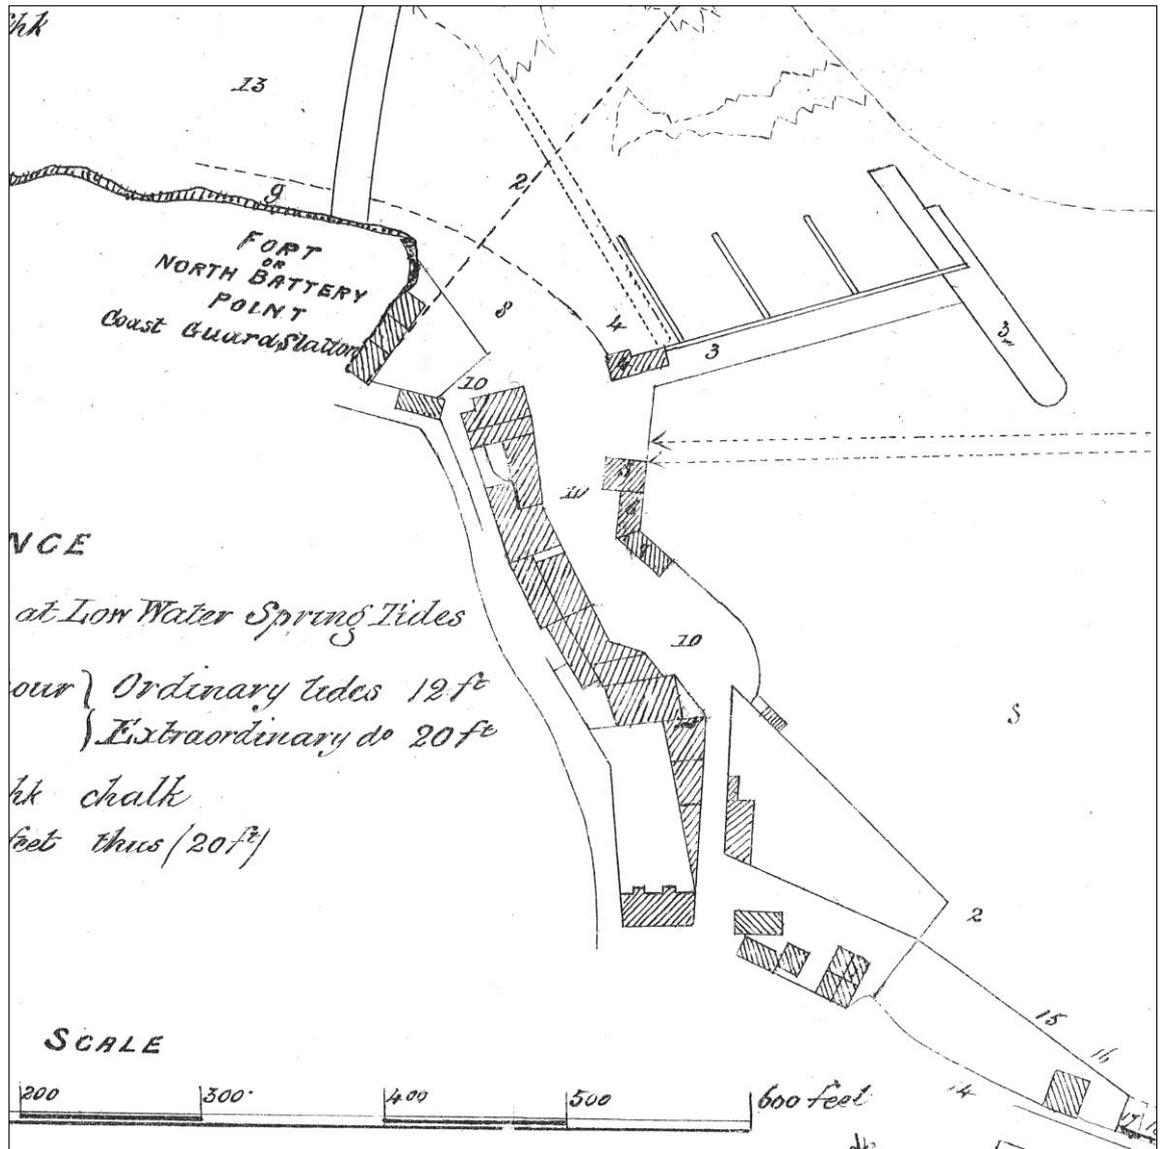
, Plan of pier and its surroundings of 1856. No. 4= Pier House, No. 5 = Droit House, 6 & 7 = Baths (under control of the Pier Commissioners)
